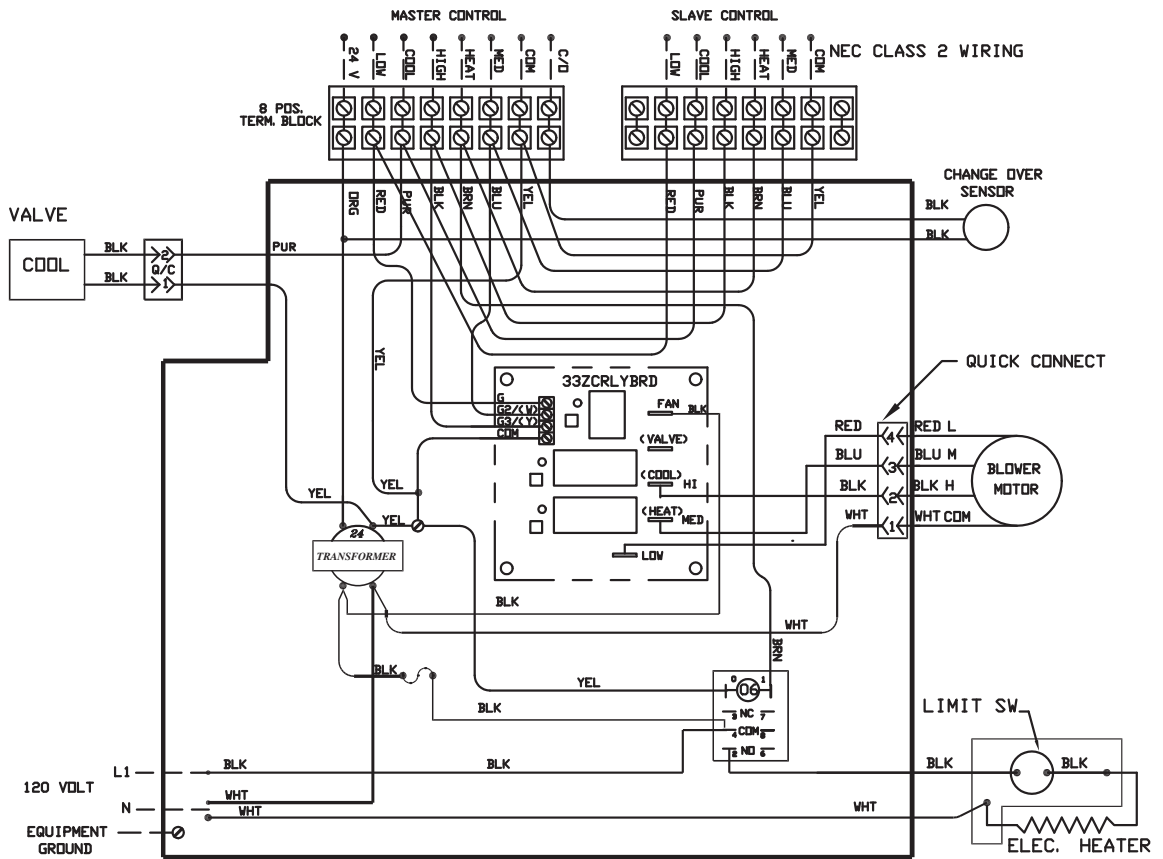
Master/Slave Wiring Diagram (Special Request) — Master Control Option
